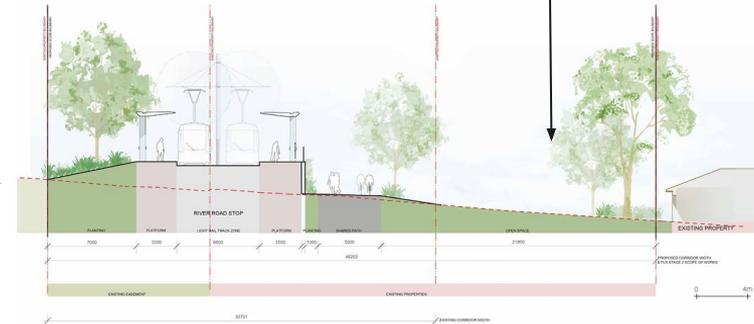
Cross section 09 - River Road Stop (indicative only - subject to design development).
